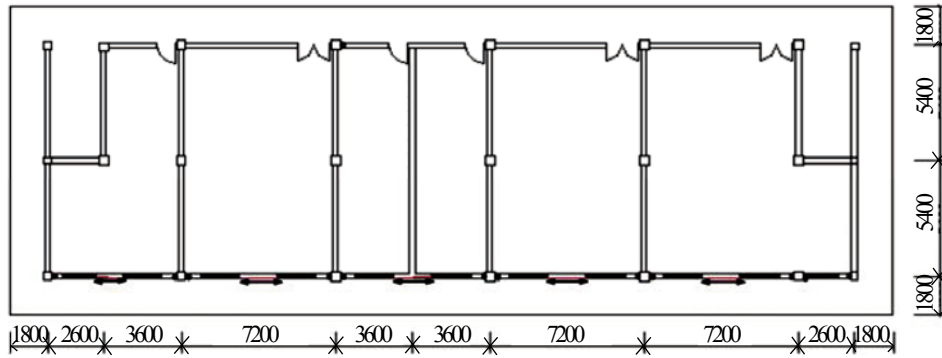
Crack positions projected onto a plan of ground floor. Black spots represent vertical cracks along the intersection of infill wall and column, and arrowhead represents horizontal cracks at the upper level of windows (length unit: mm)
